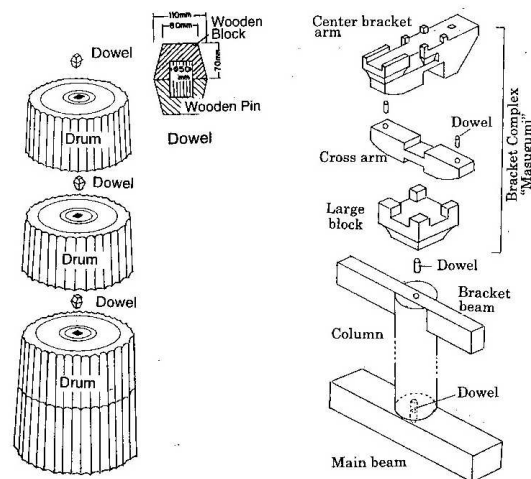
Comparison of ancient constructions of Greek masonry and Japanese timber temples – Piling up of structural members
